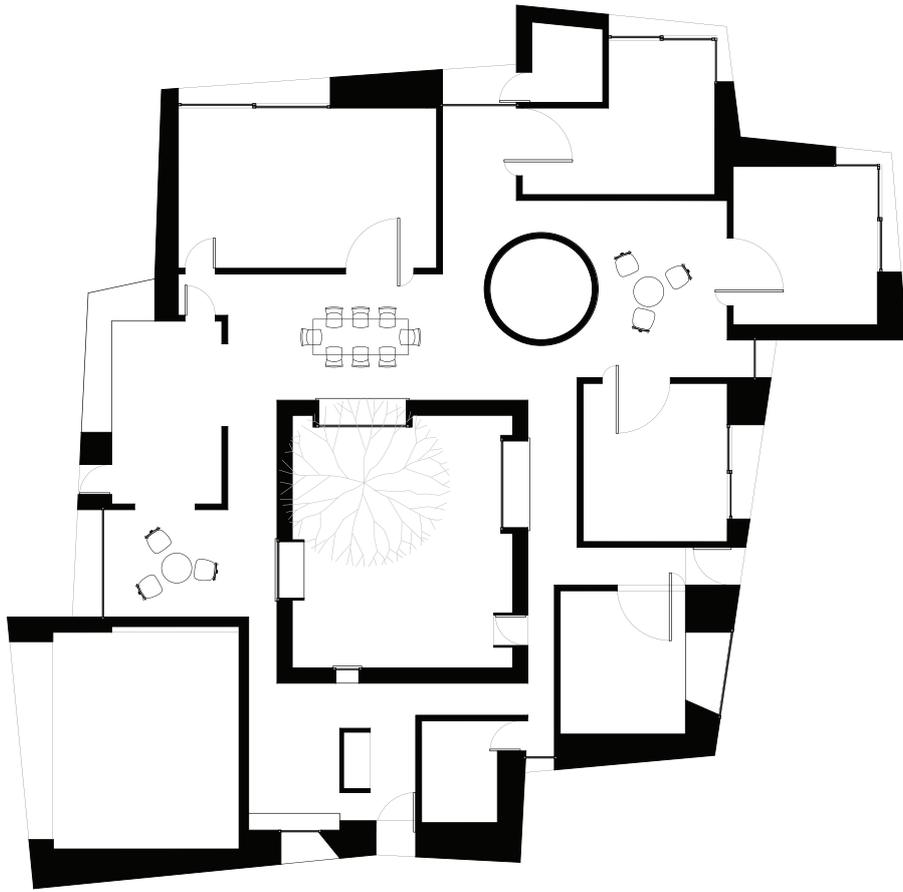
'House 250', Floor plan 1/200, Nicholas Thomas Lee, 2017
